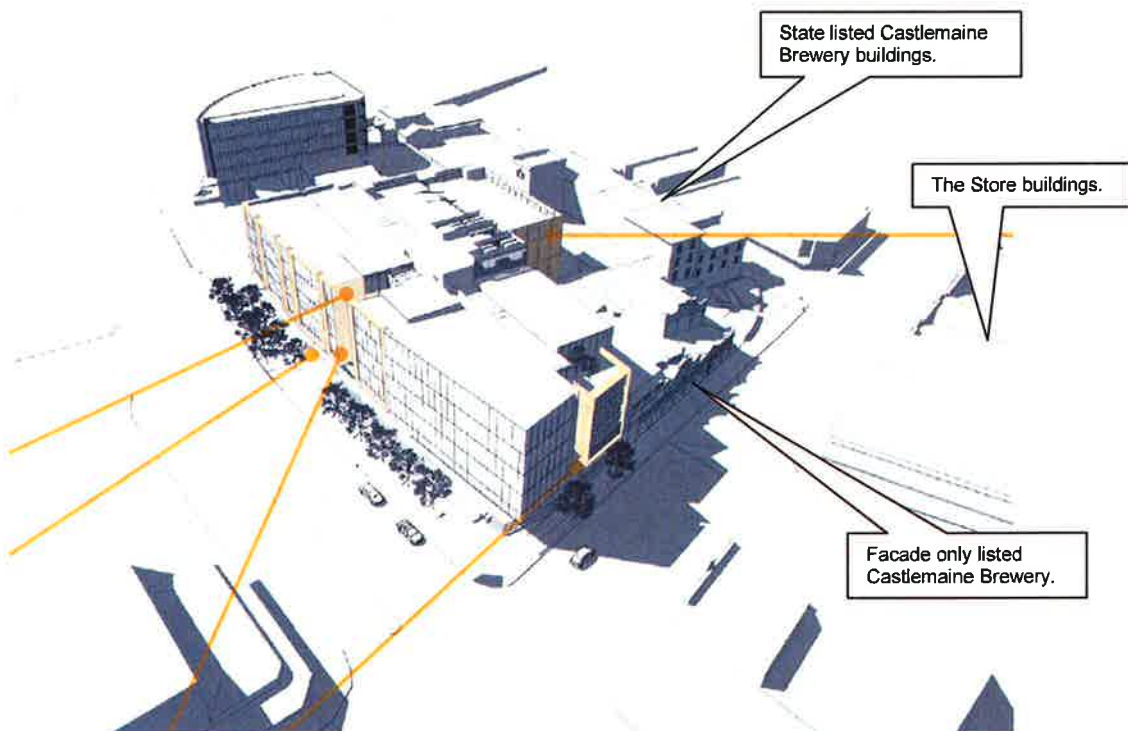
An aerial perspective showing the proposed office building on Stewart Ave with the existing former Brewery buildings on Hunter Street. (Source – PTW CKDS Architects in Association - Fig 25 Design Statement)
